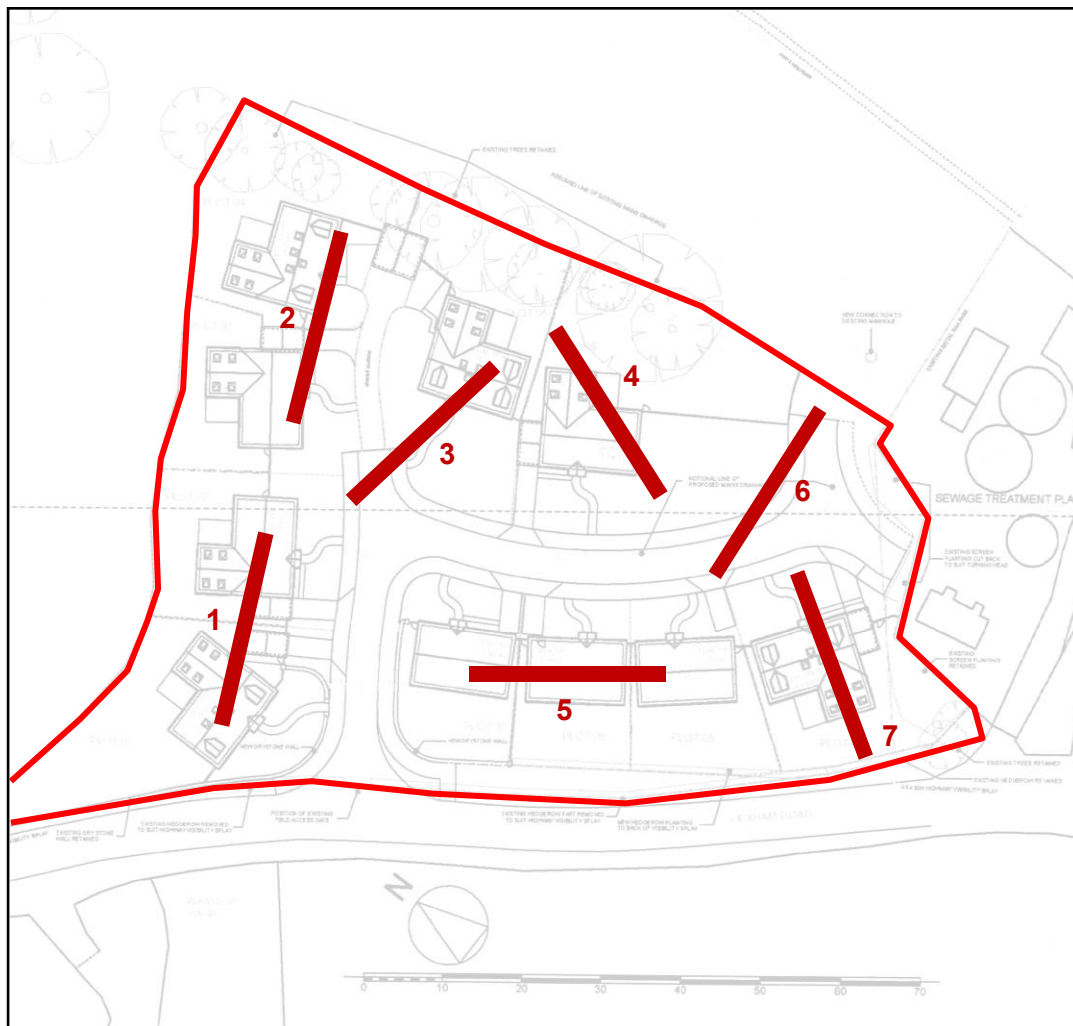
proposed development plan (grey background) of the PDA with evaluation trench locations (1 to 7) in red. All trenches are 25m long by 1.6m wide.
